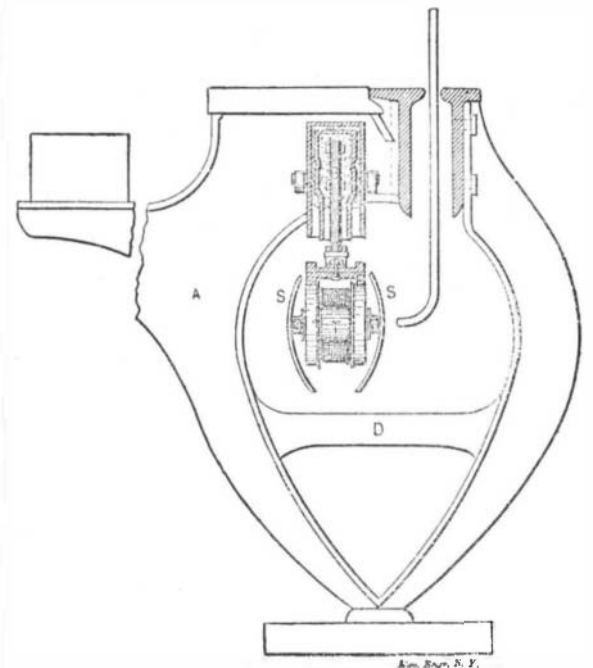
FIELD'S ELECTRIC RAILWAY CONDUIT.
